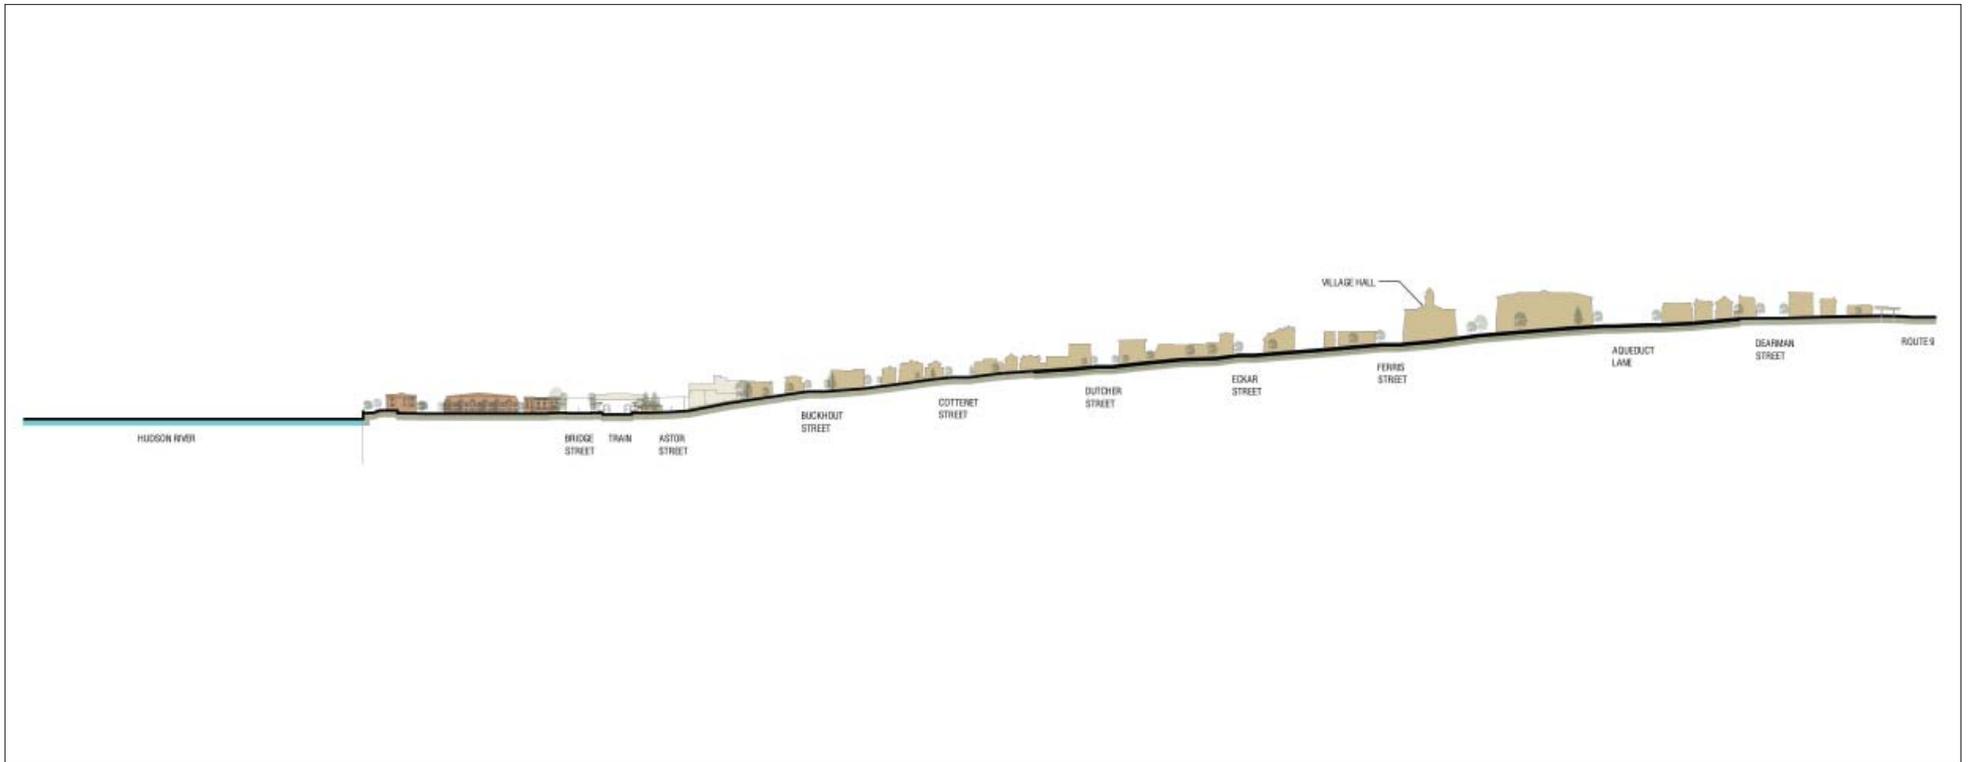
EAST-WEST SITE SECTION - MAIN STREET
